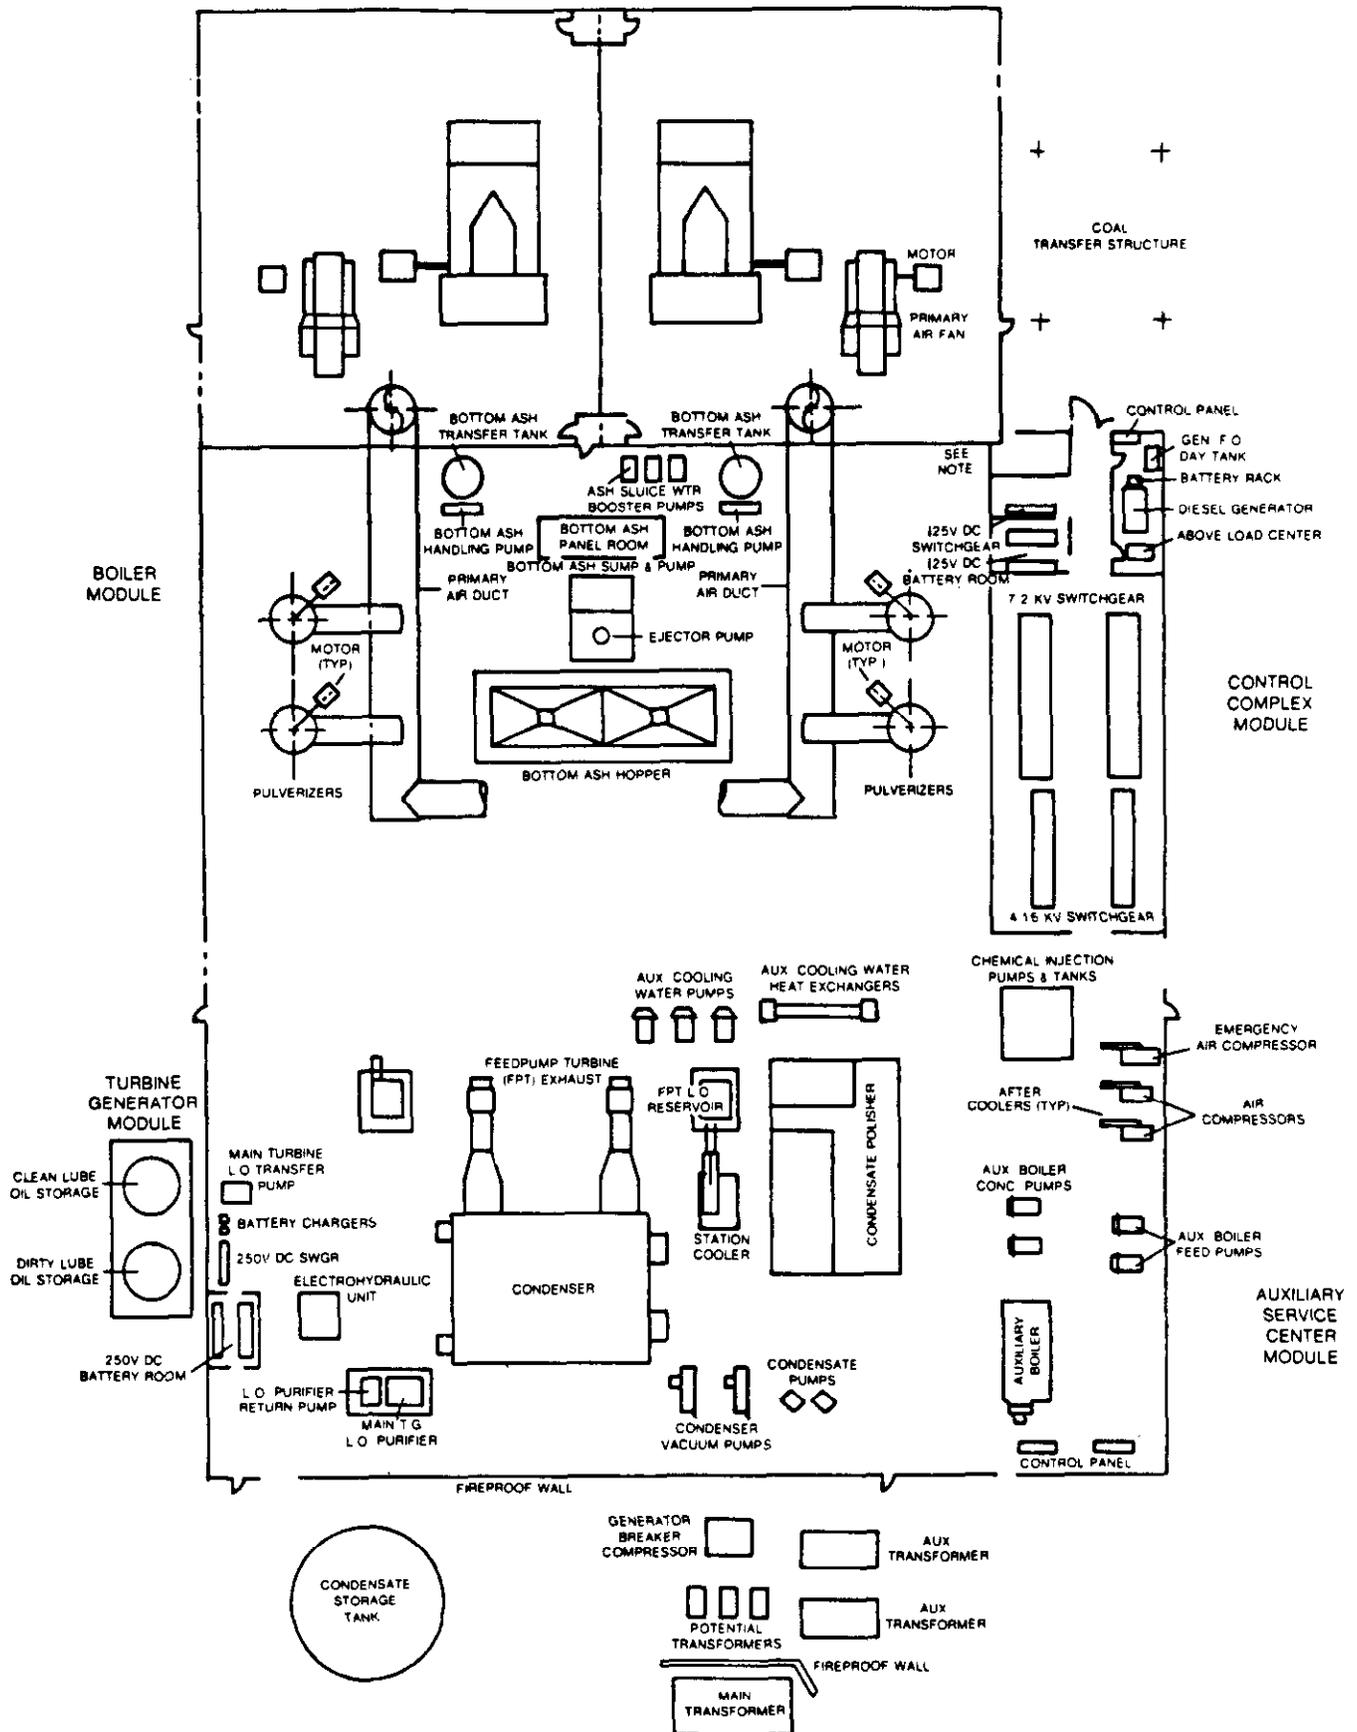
250 MWe Reference Plant Arrangement Plan Ground Floor
